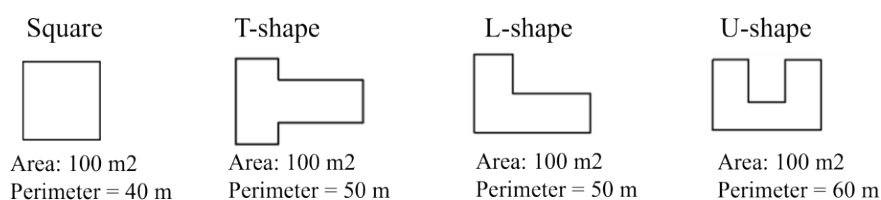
Building plan outlines based on (Hatem and Karram 2020)
